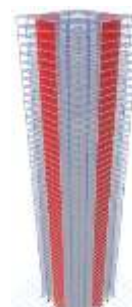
3D view of the Building with Peripheral Shear Wall
